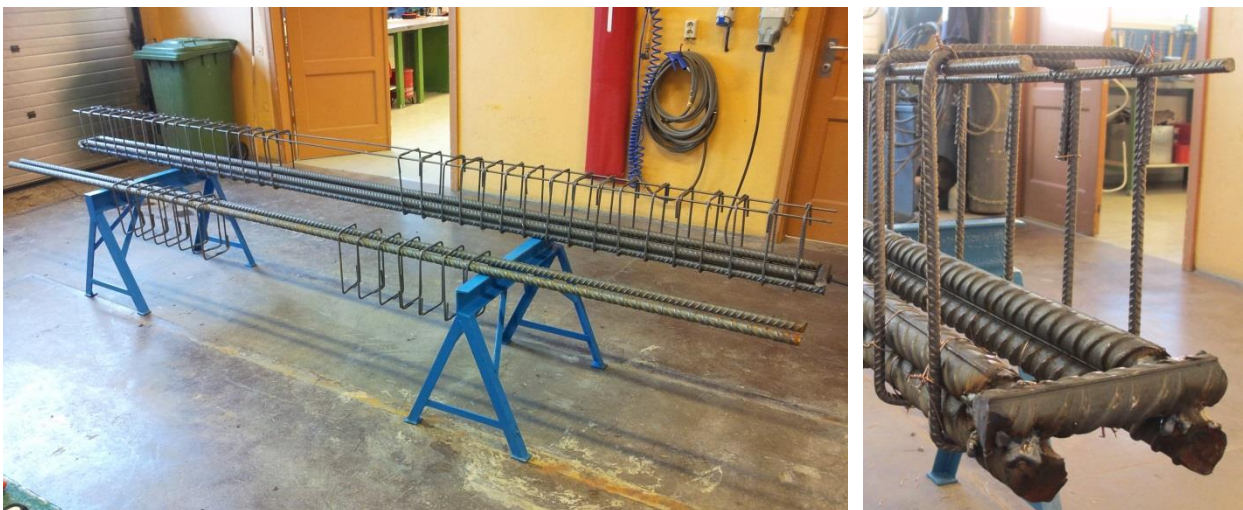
Left:* Reinforcement frames under production and completed. *Right:* Transverse anchoring bar on the end of longitudinal reinforcement.
